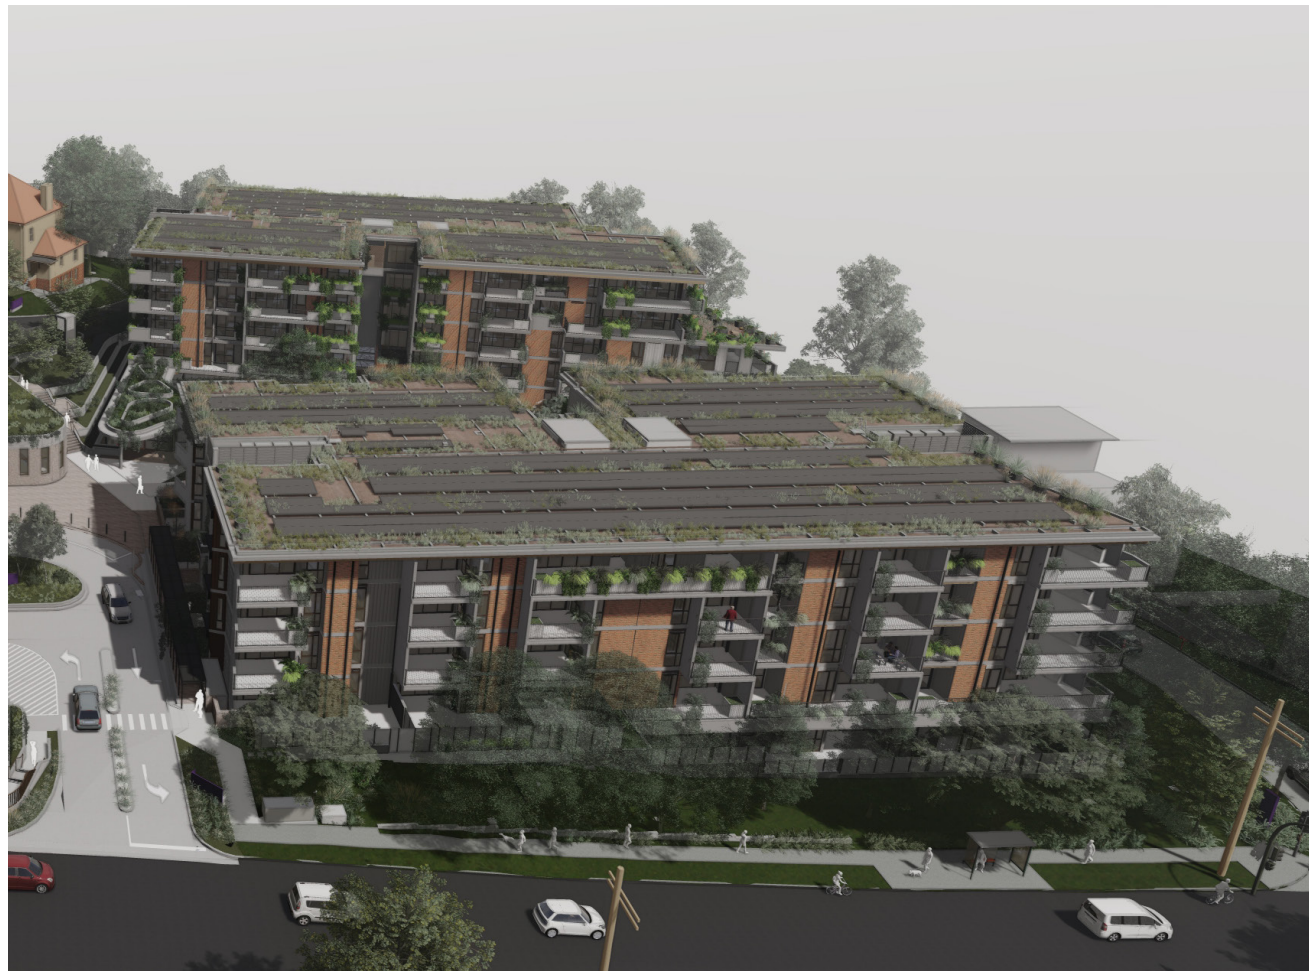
Aerial Image illustrating northern facades of Seniors Living Buildings
